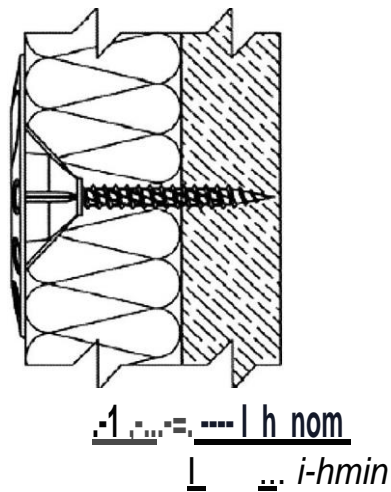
Installation example of a KOELNER-KC fastener in a wooden substrate
